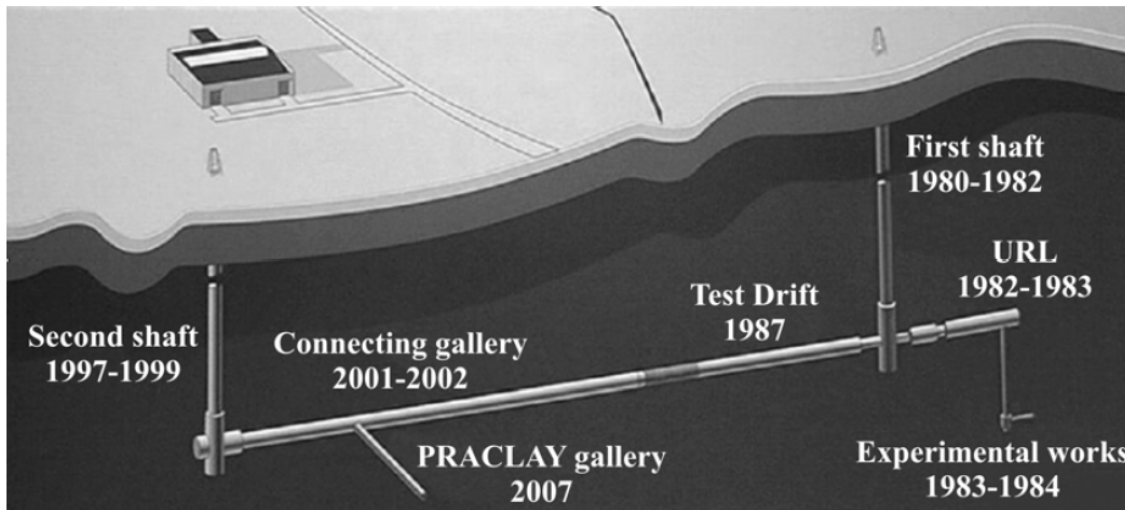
Construction history of the HADES URF (Underground Research Facility) (from Bernier et al., 2007)
